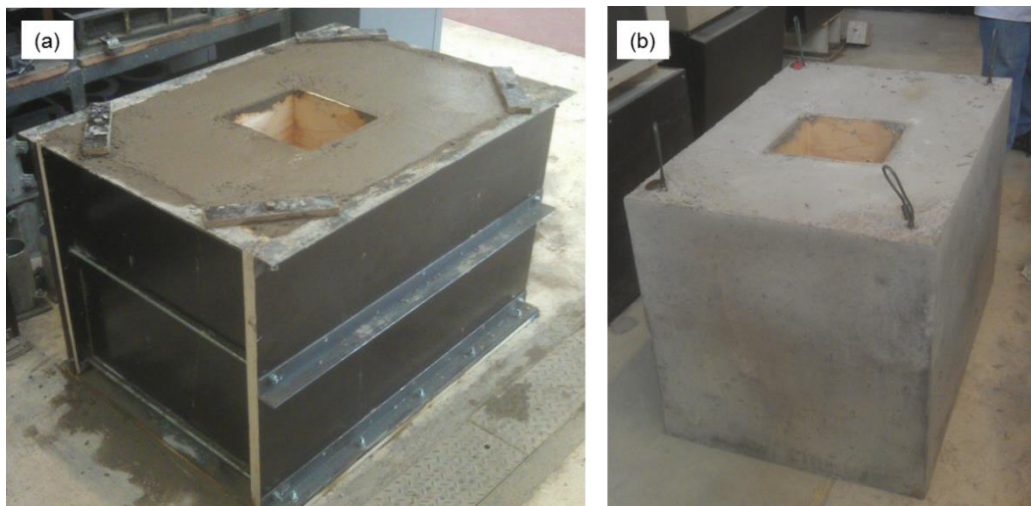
a) Concrete block inside mould and b) concrete block outside mould
